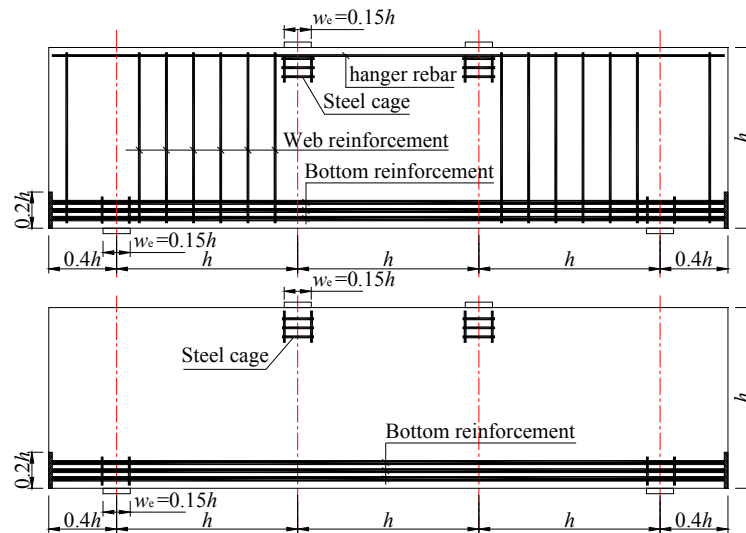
Typical reinforcement layout for specimens with and without web rebars
